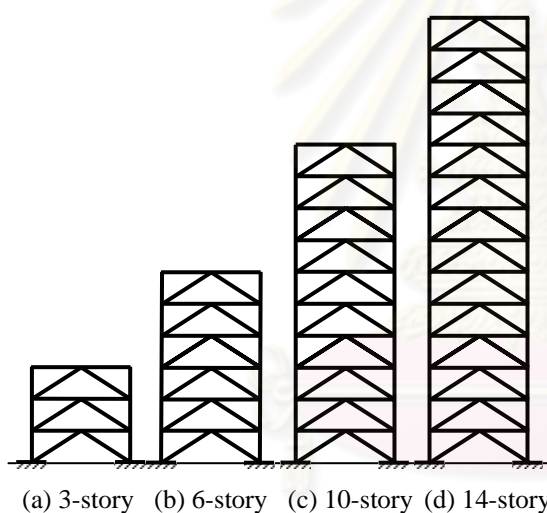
Frame elevations of 3-, 6-, 10-, and 14-story buildings.
